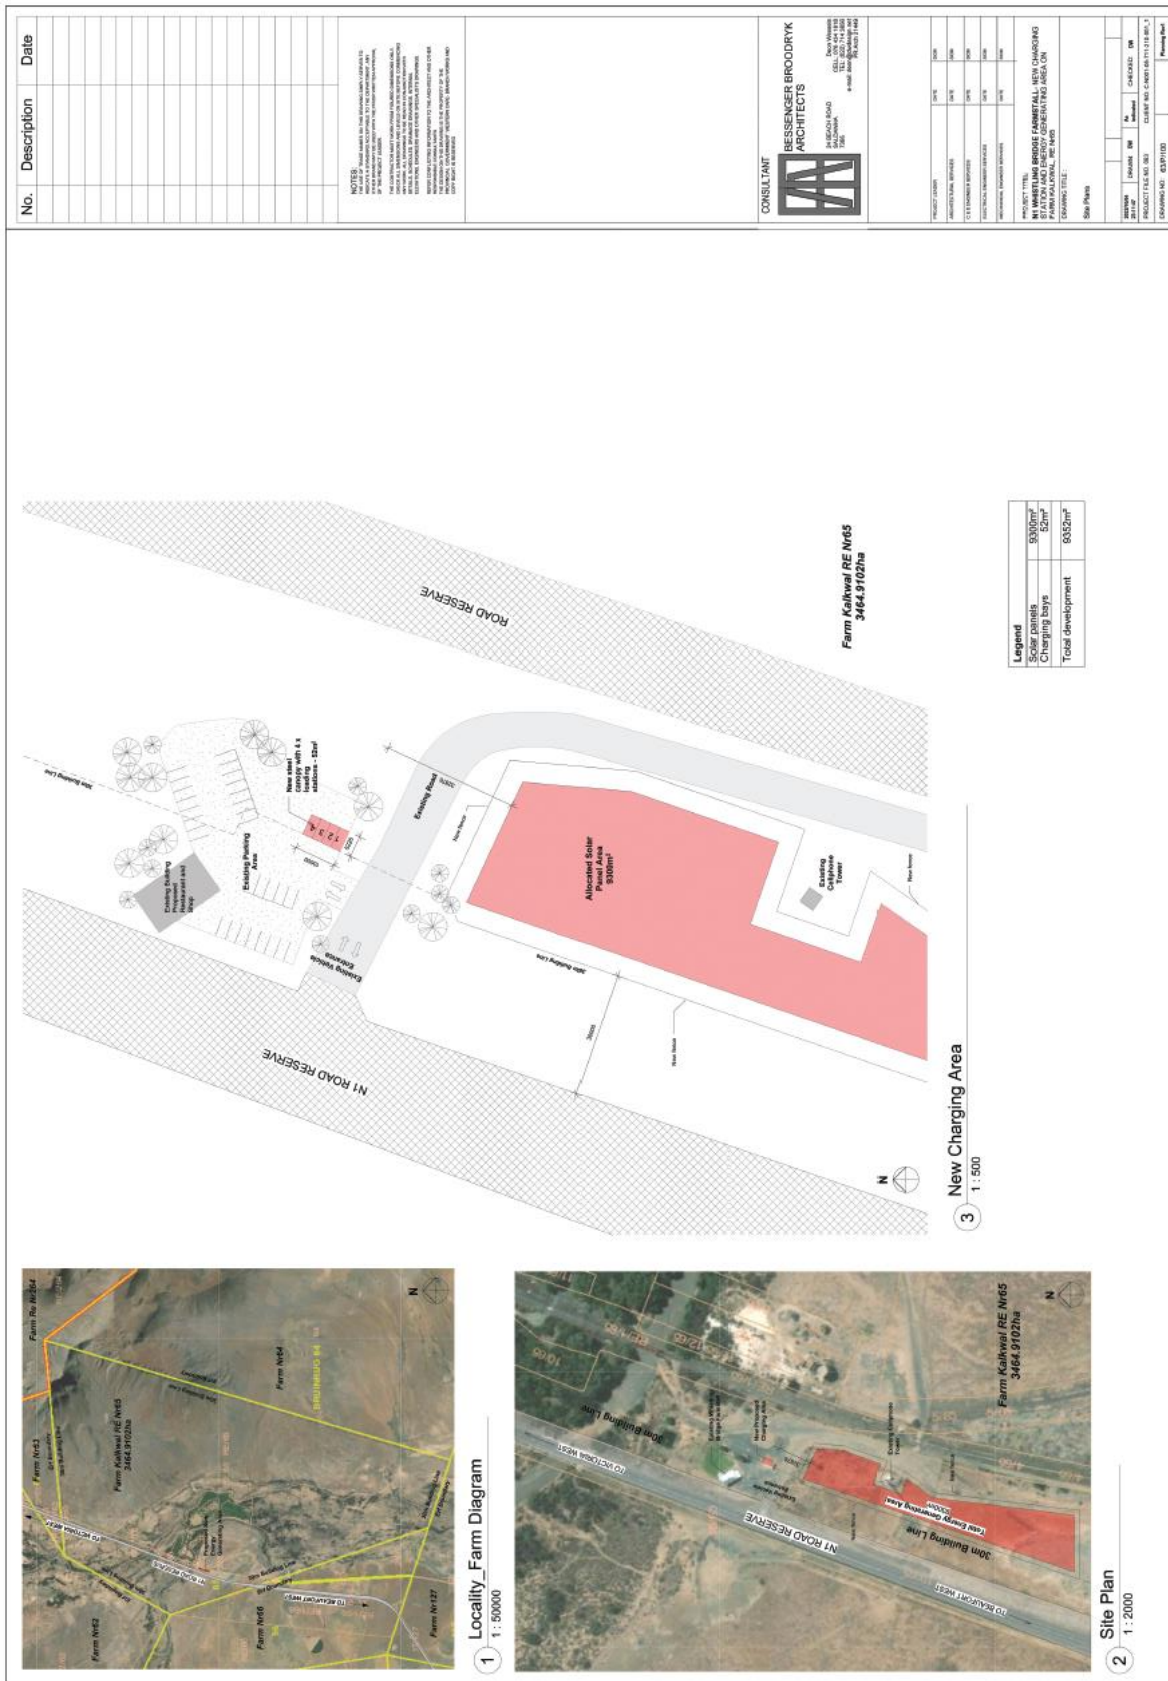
Site Development Plan – Renewable energy structure, service station, restaurant & shop
